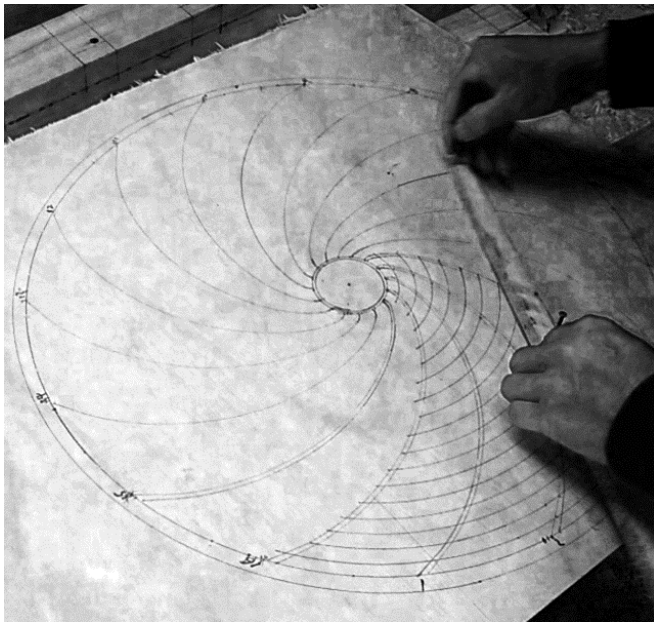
Master Liqun Zhang was demonstrating the sketch of a new-built spiral *zaojing* on site, scale of 1:10. © Jingxian Ye
